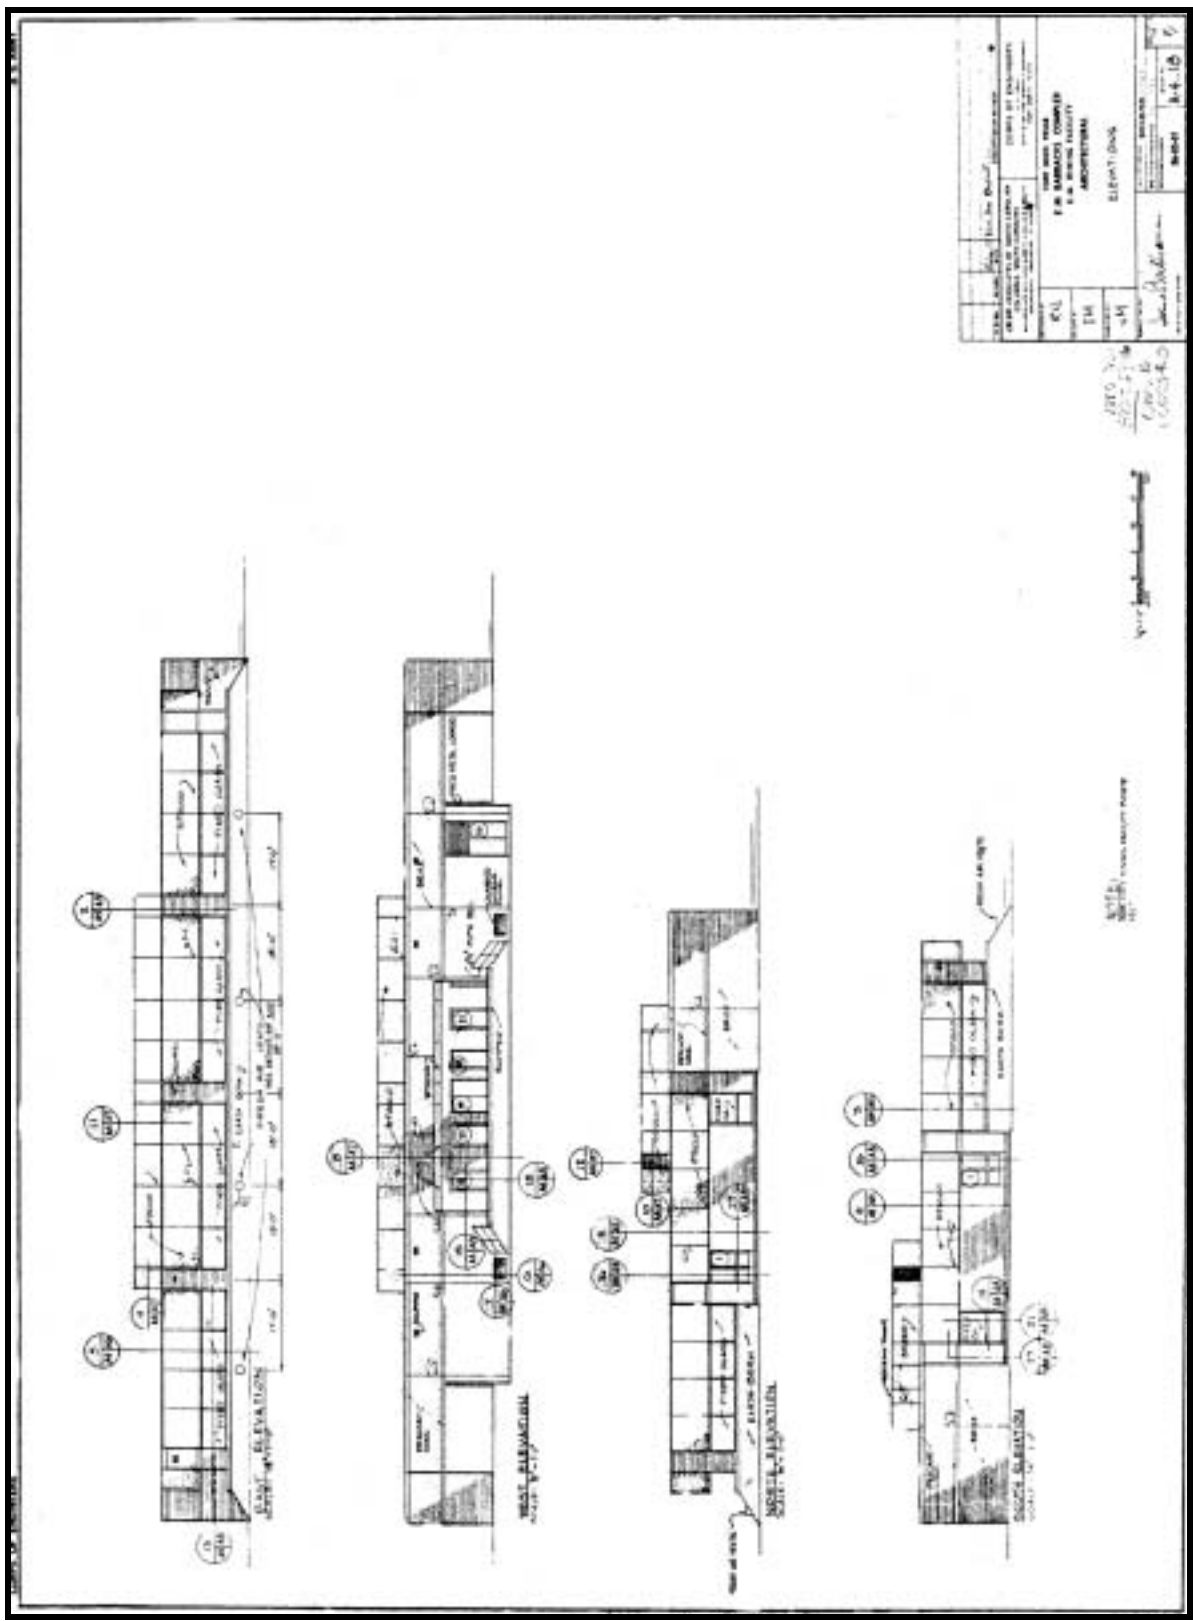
Double LBC&W dining facility, elevations, Ft. Hood (1972, revised 1975) (Engineering, Ft. Hood).
